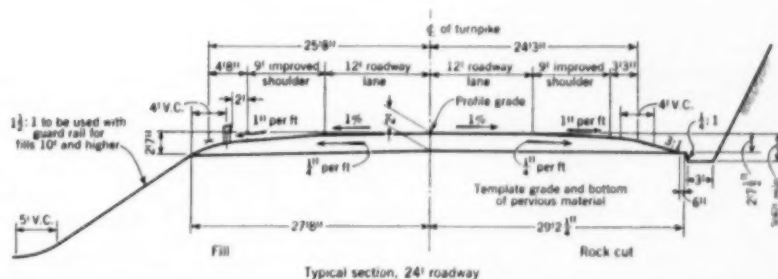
Typical roadway cross section is shown half in rock cut and half in fill. Extra 12 ft of pavement width is added wherever profile is such as to slow trucks appreciably below normal 60-mph design speed.
